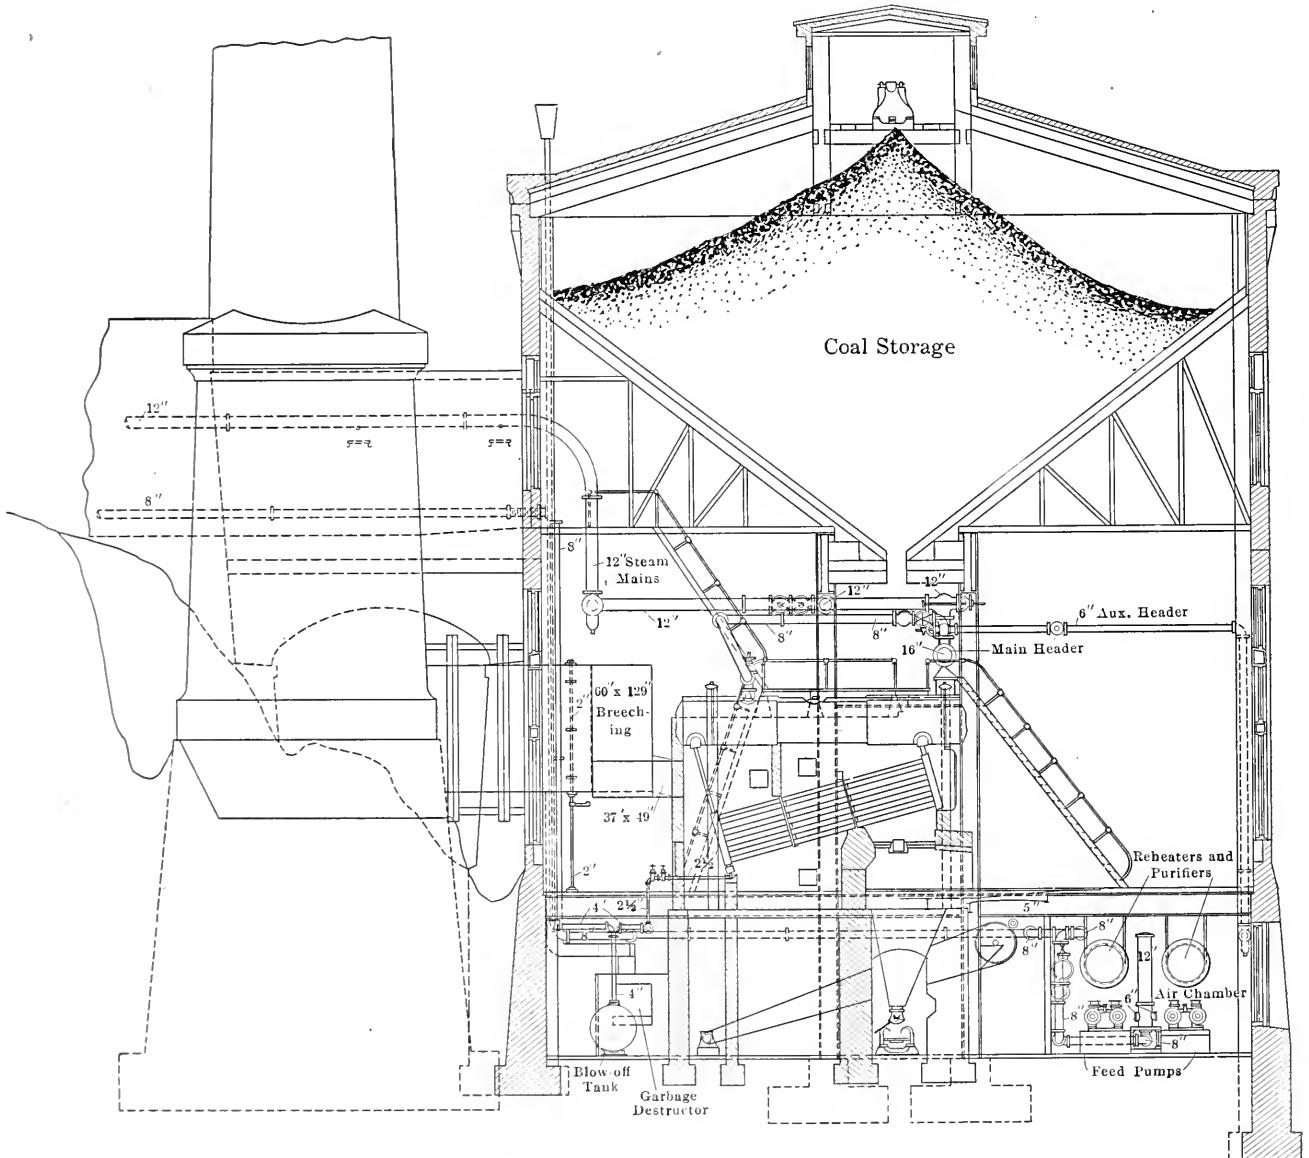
TRANSVERSE SECTION THROUGH BOILER HOUSE
